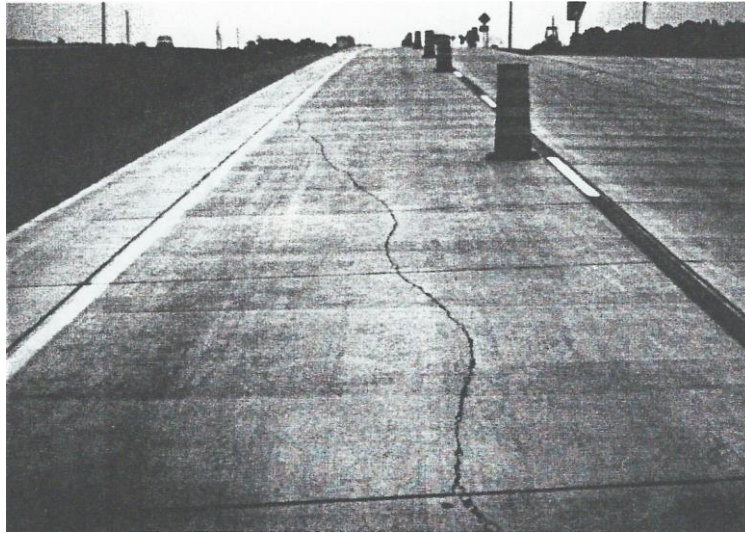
Photo showing longitudinal cracking on outside lane on a section of JPCP.
